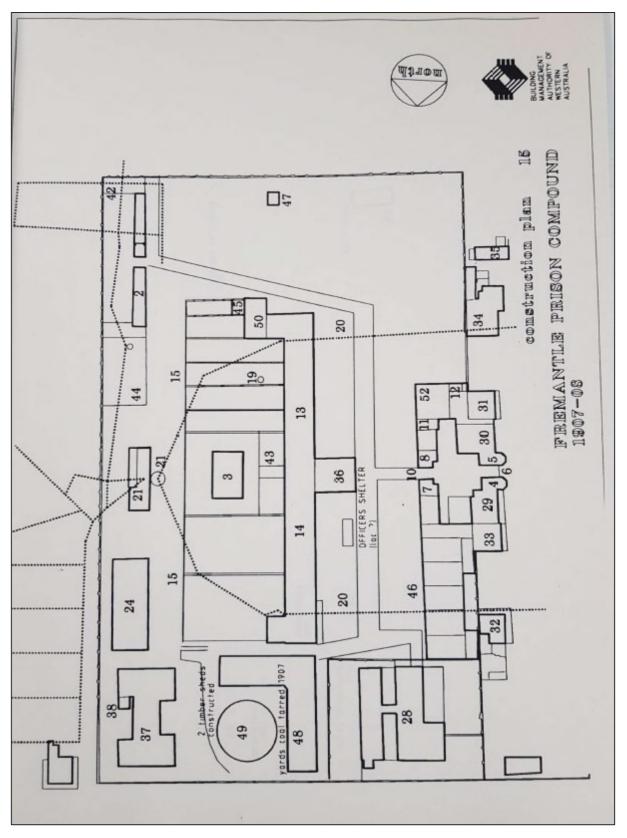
1907 – 1908 Construction Plan as per Bavin 1990b
